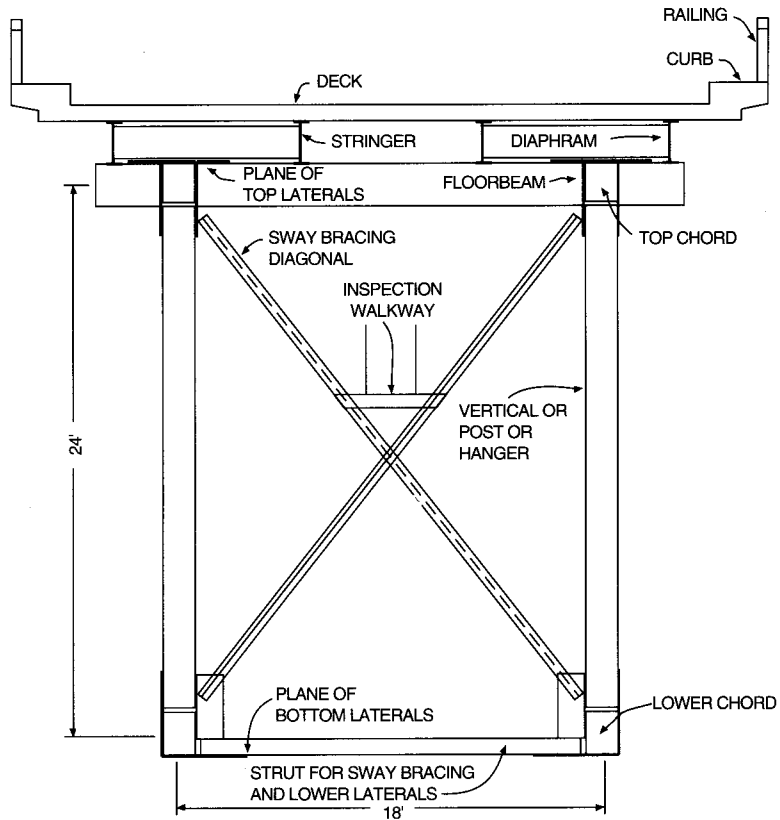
Cross section shows principal parts of a deck-truss highway bridge.
